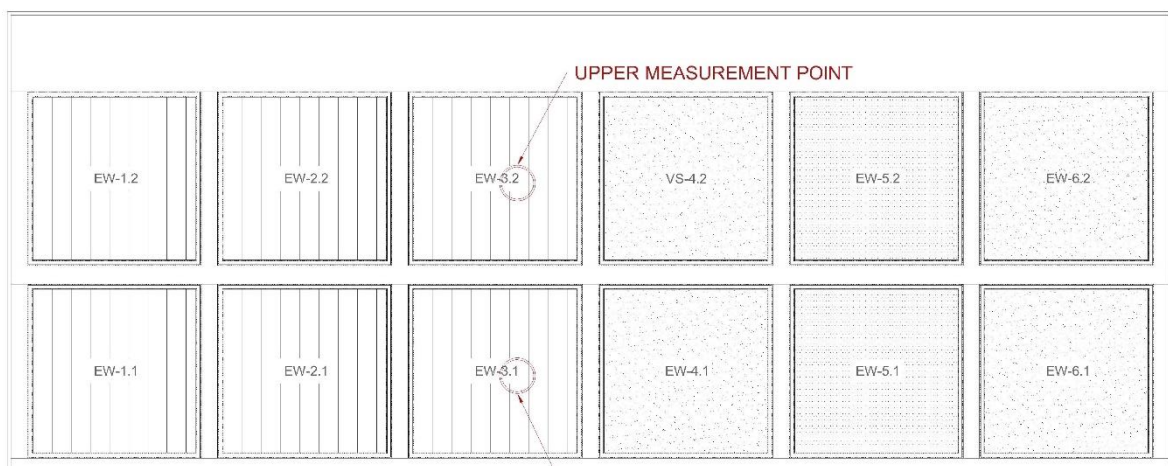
Scheme of measurement point placement in test room. (Technical drawing by V.Kukk, adjusted by author)
